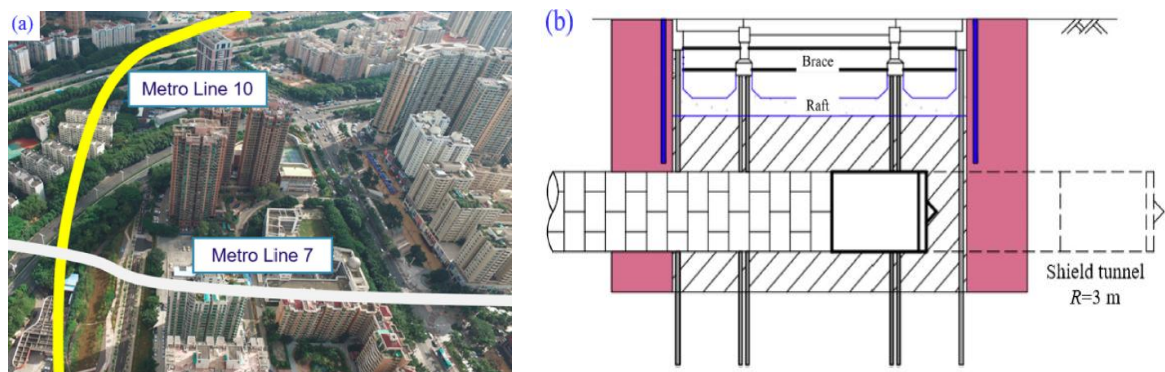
Typical subway tunnel construction crossing a pile group in a complex urban environment
